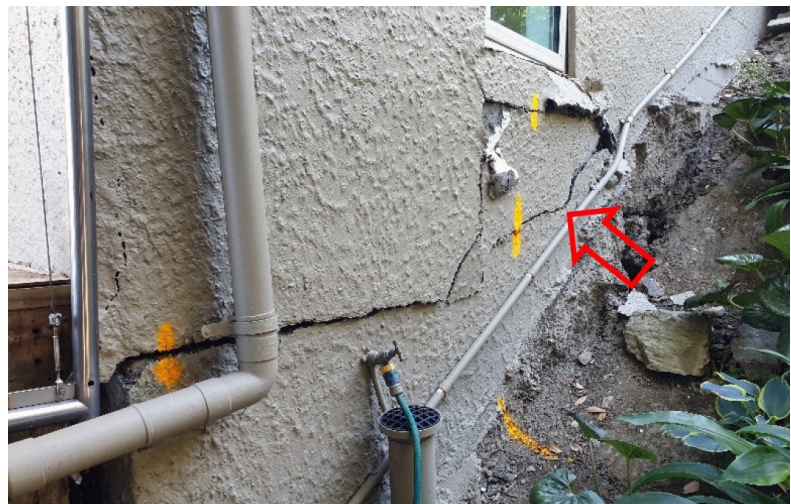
Photos from Mitchell Vranjes Structural Engineering Report illustrating the internal and external damage observed at northwestern corner.
